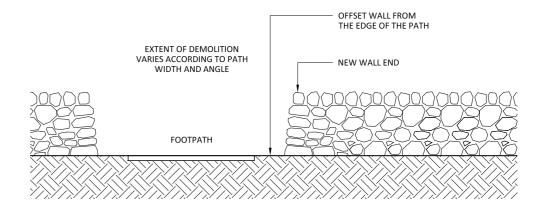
An example of a dry stone wall demolition and reconstruction plan, including offsets for the new footpath.
